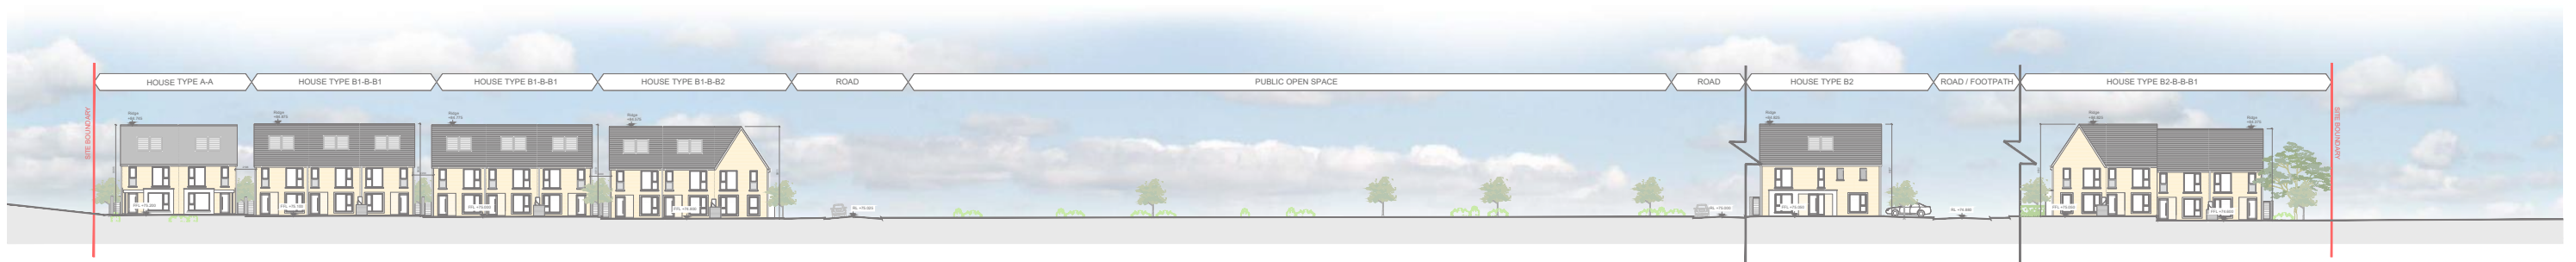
Context Elevation D-D- Refer To Drawing 1023 - Contextual Elevations Sheet 2 of 2
